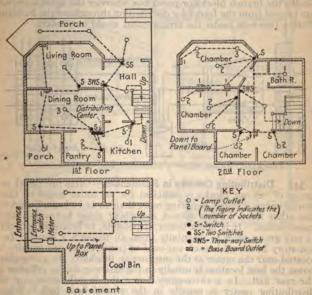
Wiring lay-out in a two-story house (Conduit Method).
